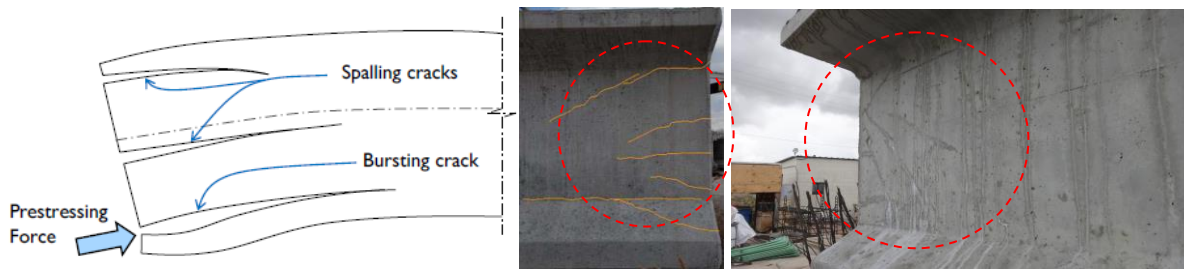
Bursting and spalling at end-region of prestressed concrete girder (O’Callaghan and Bayrak 2008; Dunkman 2009; Kim 2017)
